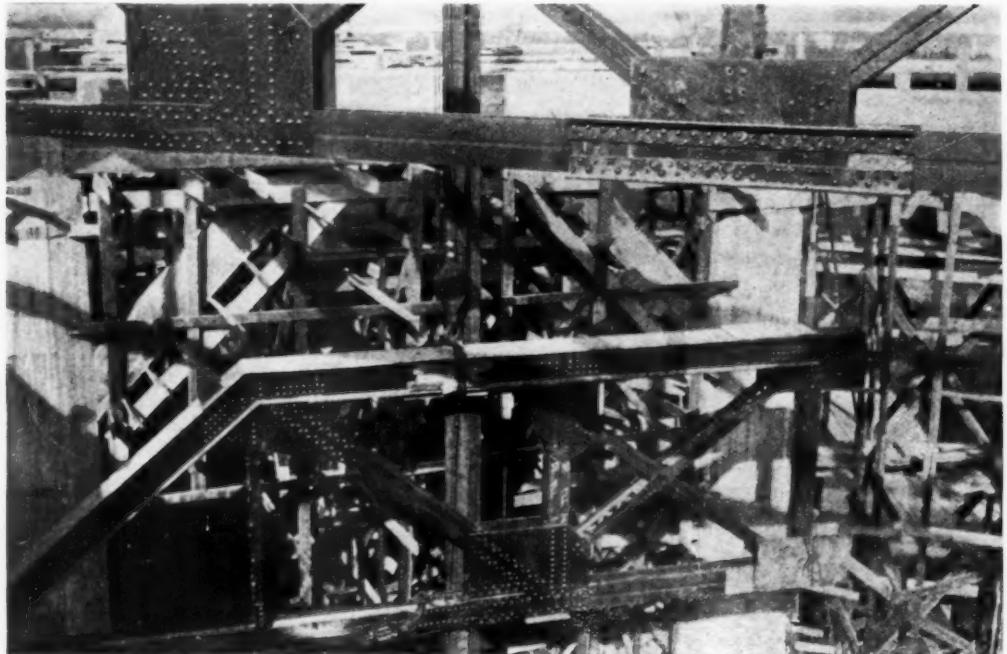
The lower chord of a half-truss suspended in position and a half-truss being raised to position.
